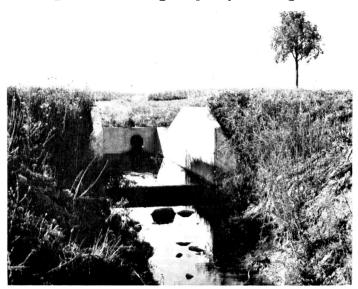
Box-inlet drop spillway used to provide overfill control of surface water and protect tile outlet.
